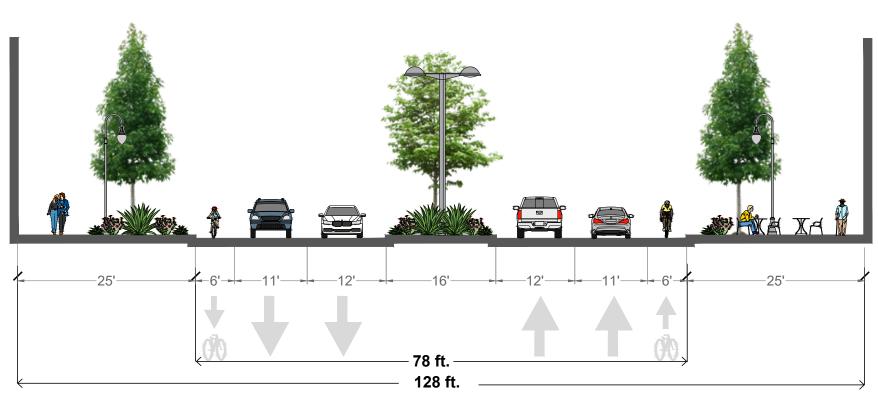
The Vision Plan proposes to include a landscaped center median, bike lanes, and landscape bump out elements to enhance Main Street.
